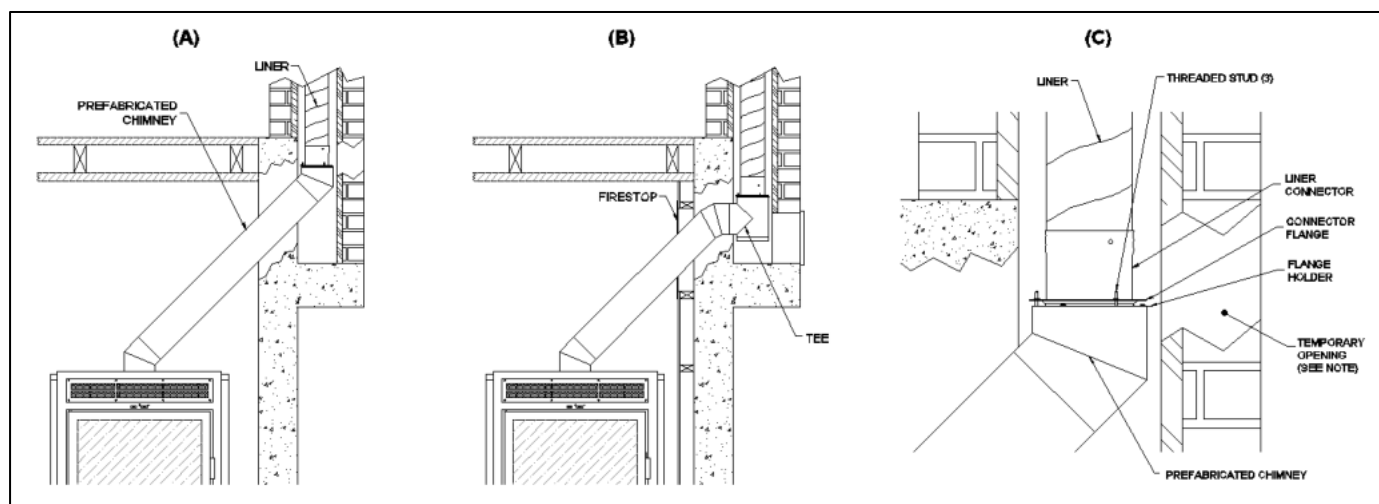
(A) Connection into a masonry chimney through an elbow/liner; (B) connection into a masonry chimney through a tee/liner; (C) detailed drawing of masonry chimney connection.
